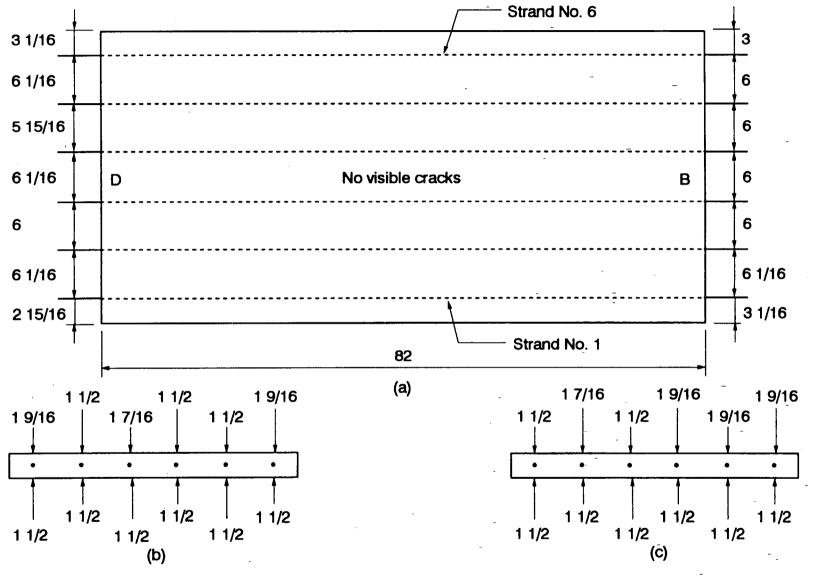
Specimen No. 7-3.0TU-2 (dimensions shown in inches):
